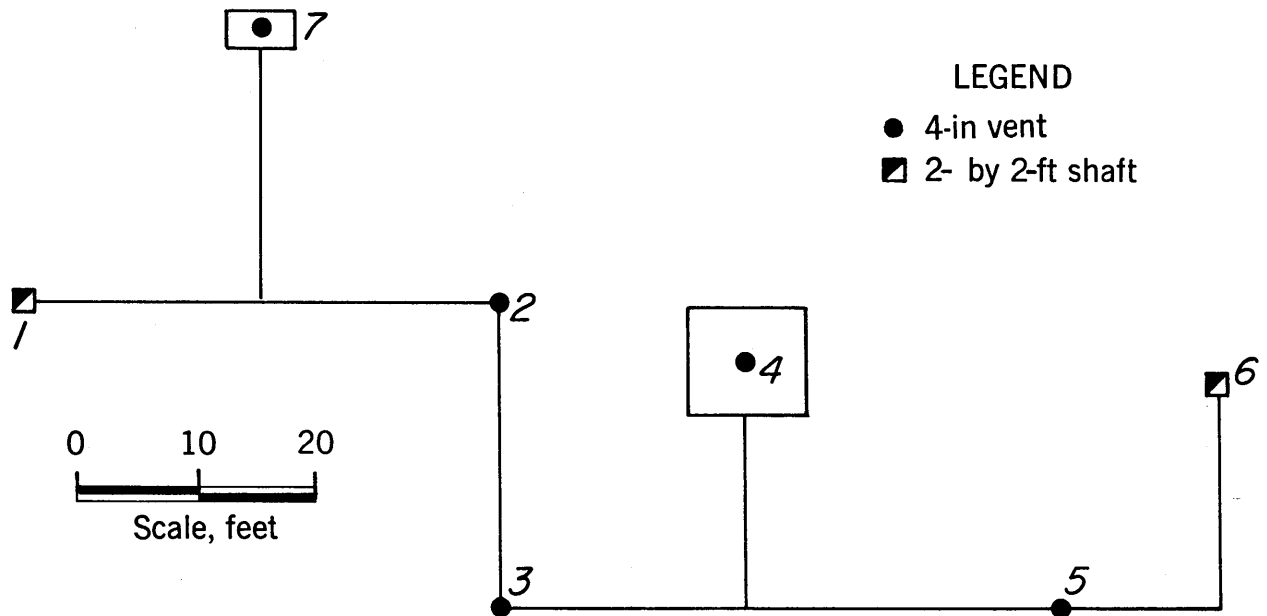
Schematic of Typical Hand-Dug Tunnel Showing Gas Sampling Points and Rooms.
